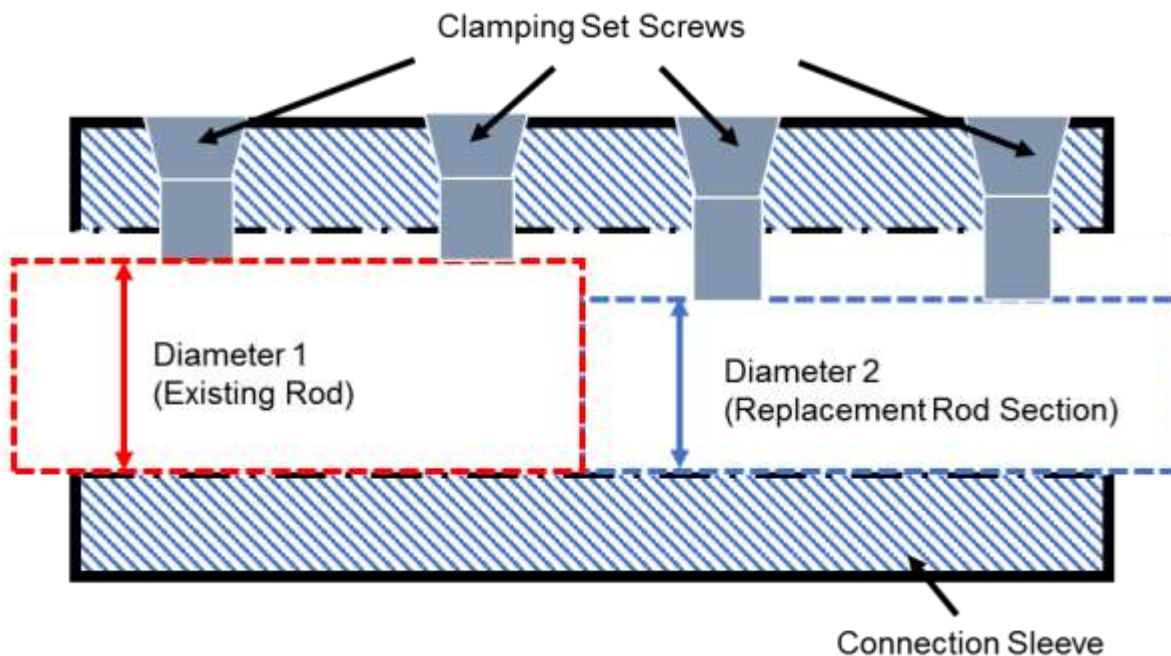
Depiction of connection sleeve used to connect a replacement rod section to the remaining section of the existing rod
